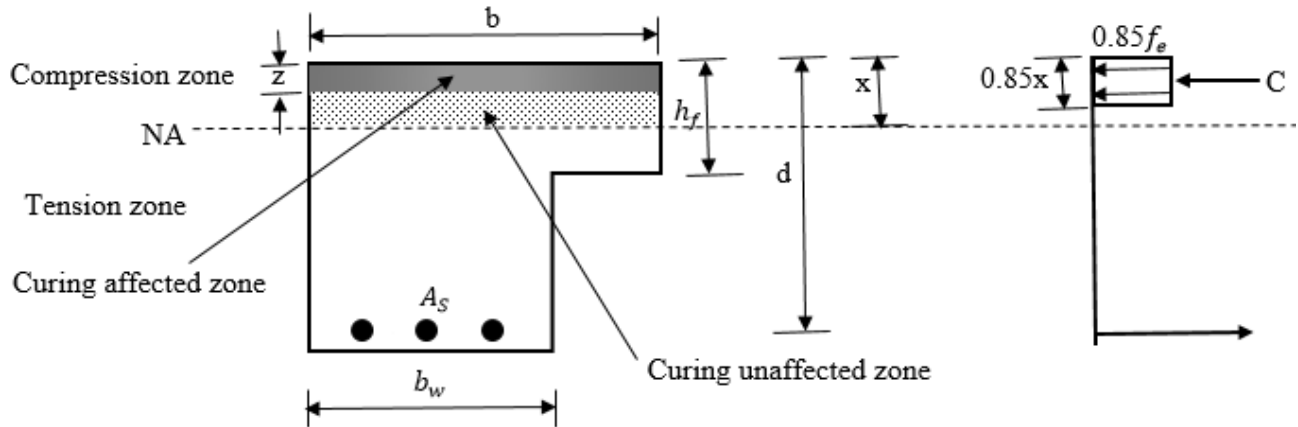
Cross-sectional view of L-section singly reinforced beam (NA within flange)
